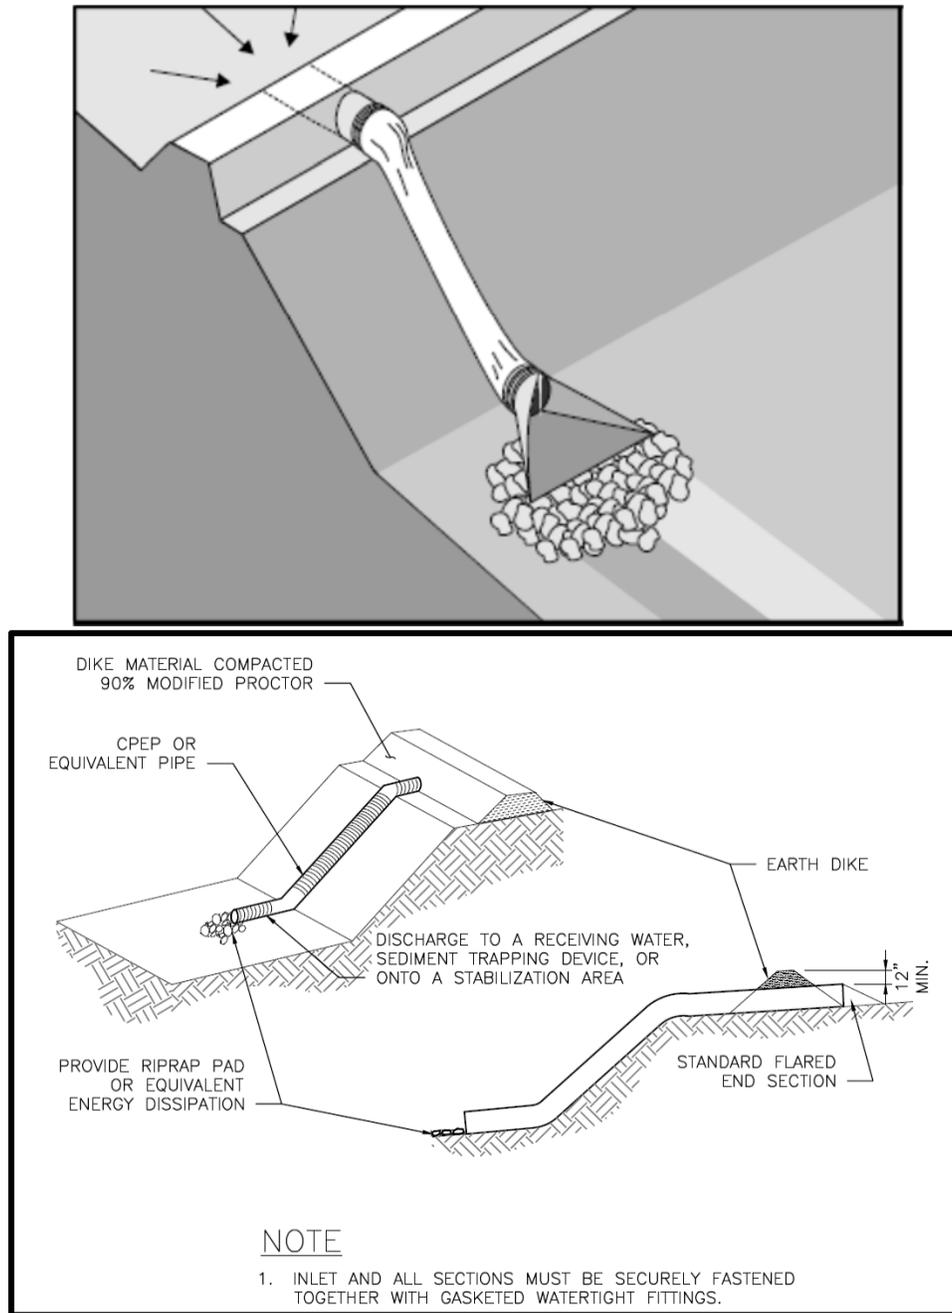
Schematic of a Pipe Slope Drain Details.
